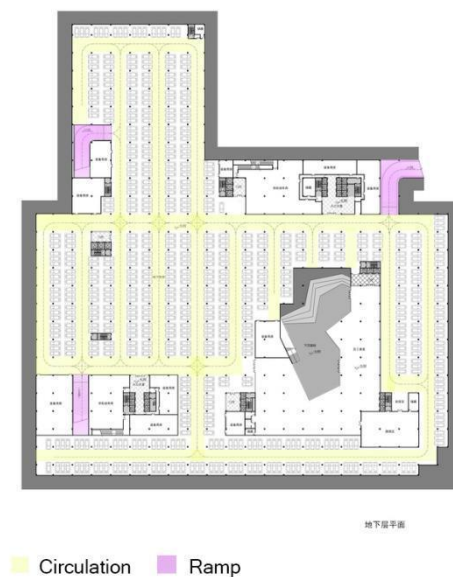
Basement Floorplan (Source: ArchDaily),(illustration: Author,2021)
